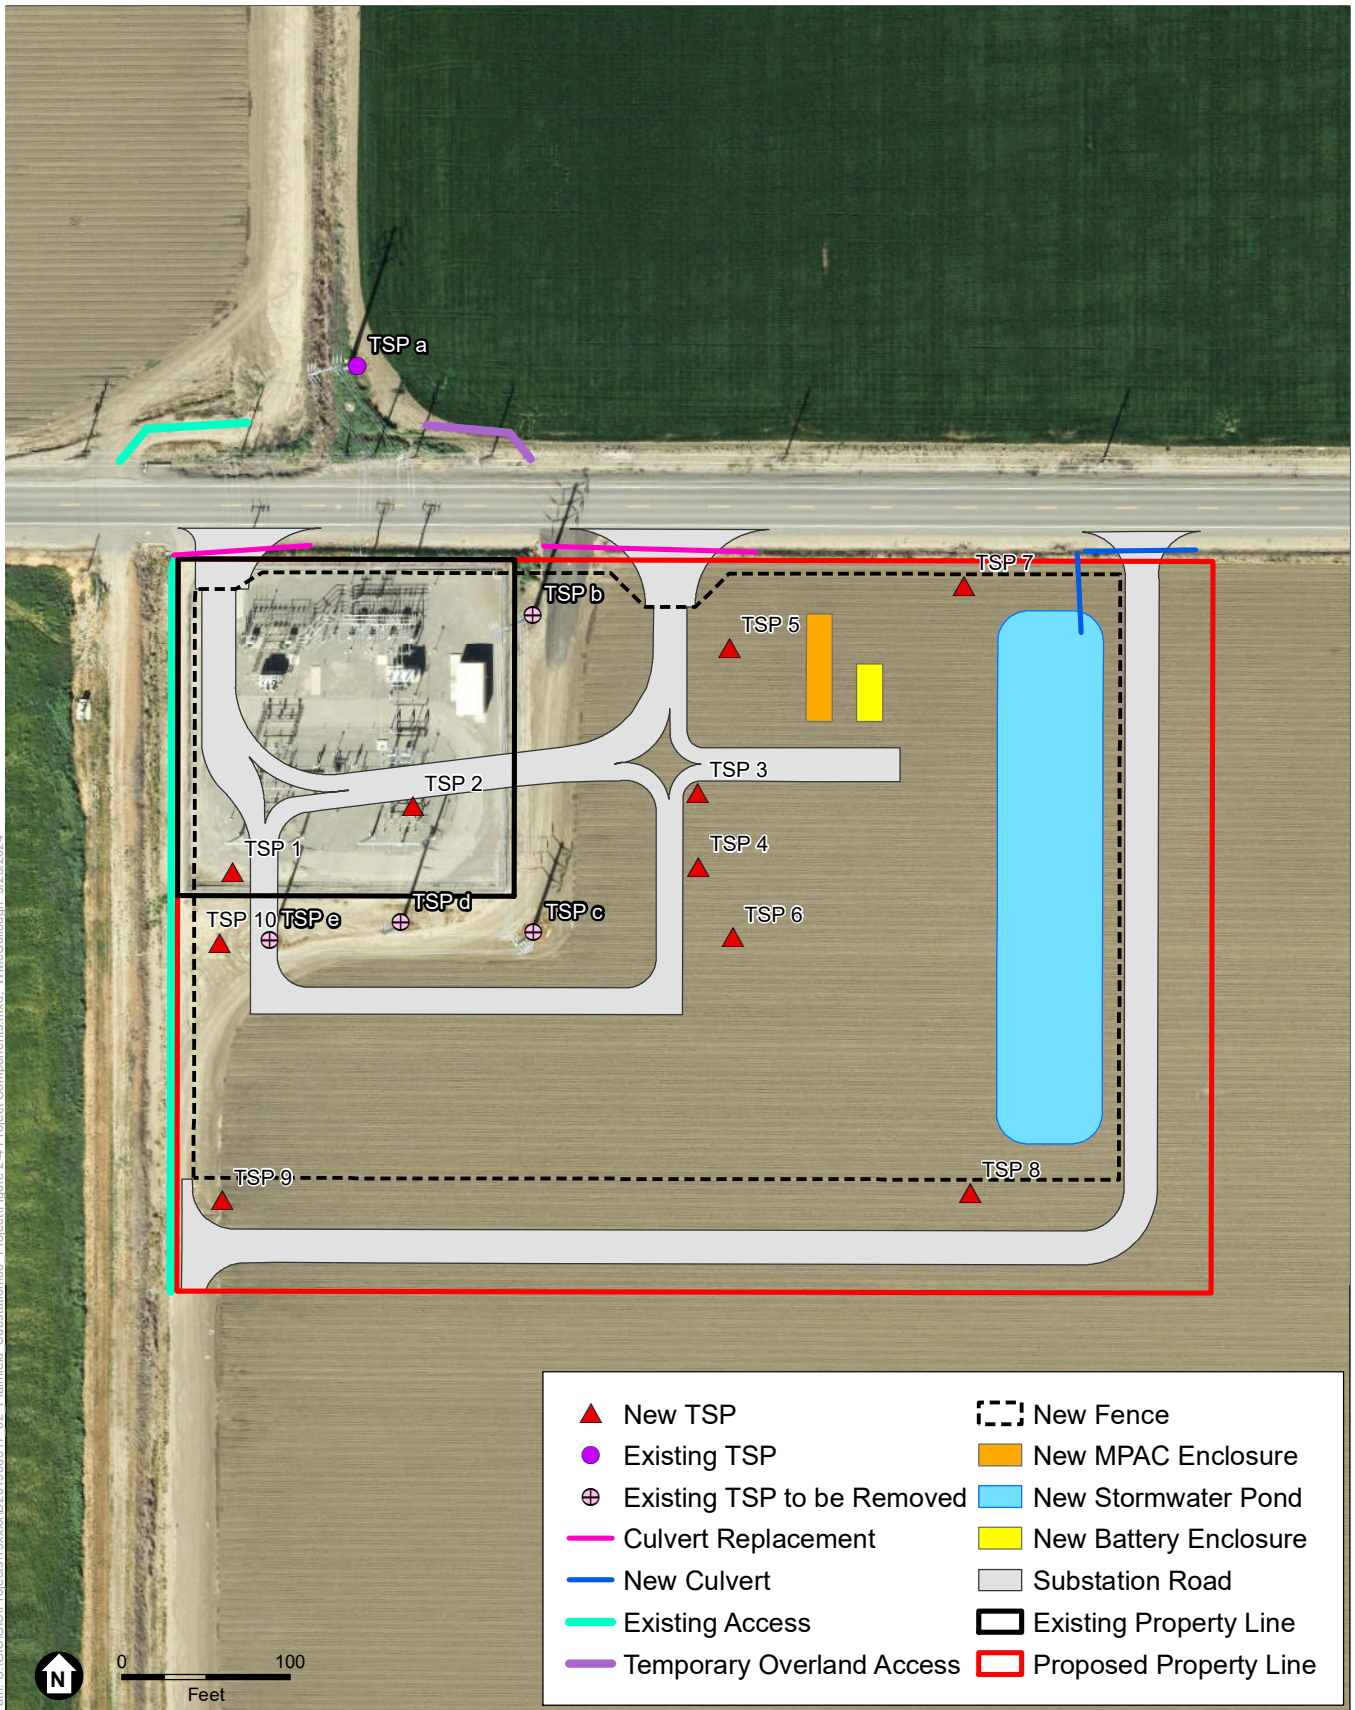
, *Project Components*, provides an overhead view of the on-the-ground Project components and temporary work areas. Figure 2-5, *Substation Plan (Existing)*, provides a general site plan of the existing Plainfield Substation site. Figure 2-6, *Substation Plan (Proposed)*, displays the proposed site layout of the Plainfield Substation. Figure 2-7, *Substation Profile*, shows the existing and proposed profiles of the substation as viewed from west of the Project site.
